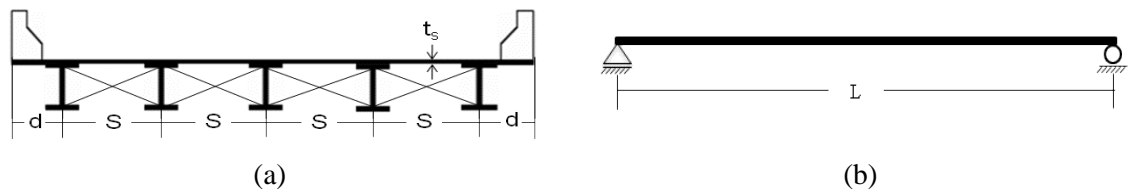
Standard bridge arrangement (a) cross-section, (b) elevation
